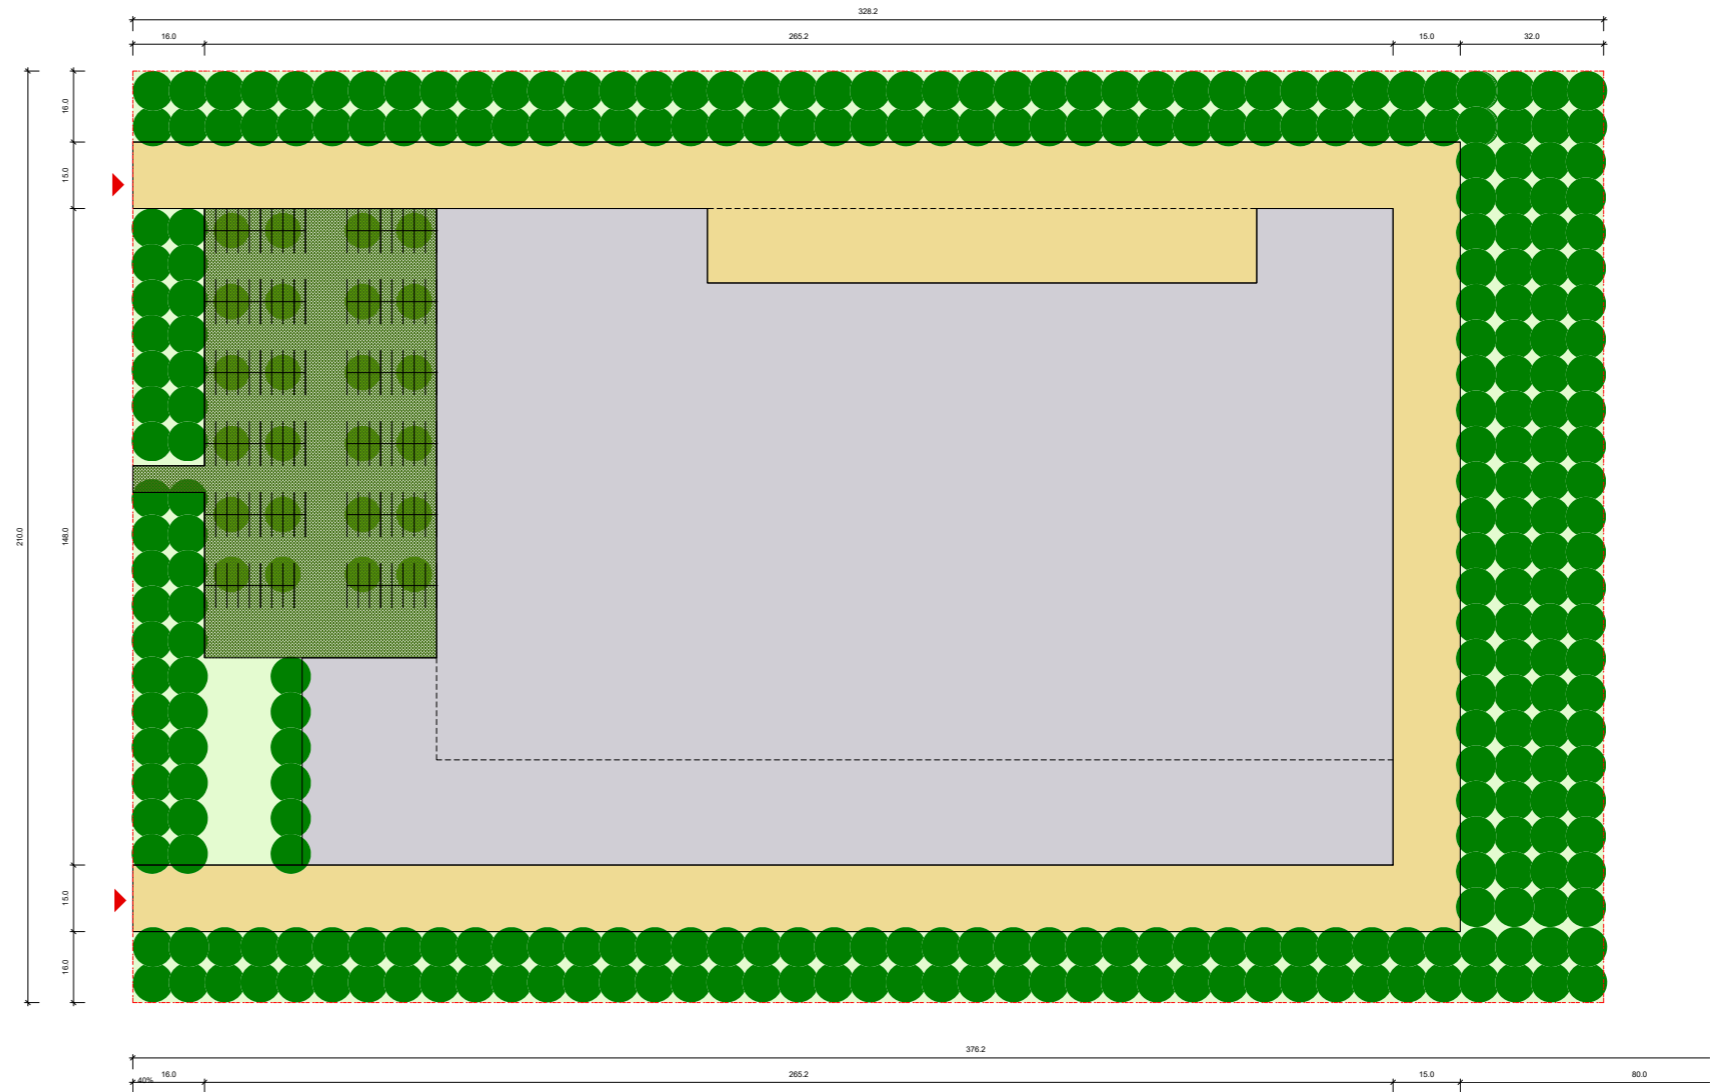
Strategy 1 Industrial – Large floorplate, pervious paving and perimeter planting
